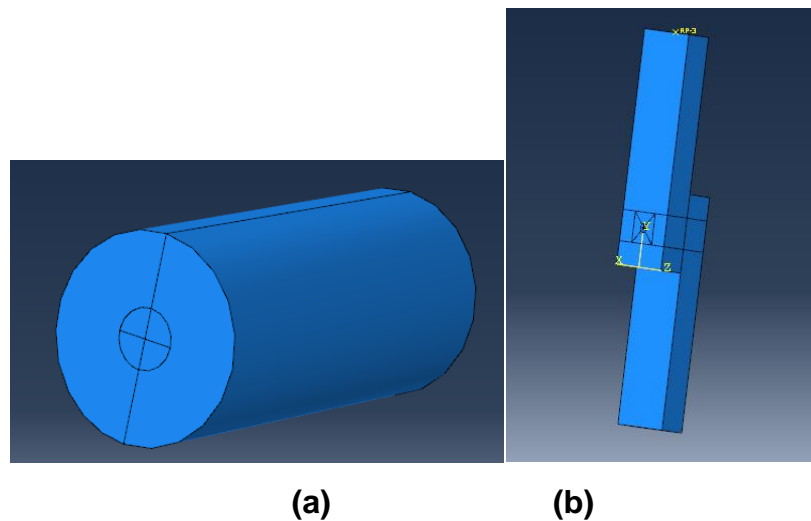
Assembly model drawing: (a) composite dowel, (b) Single shear specimen
